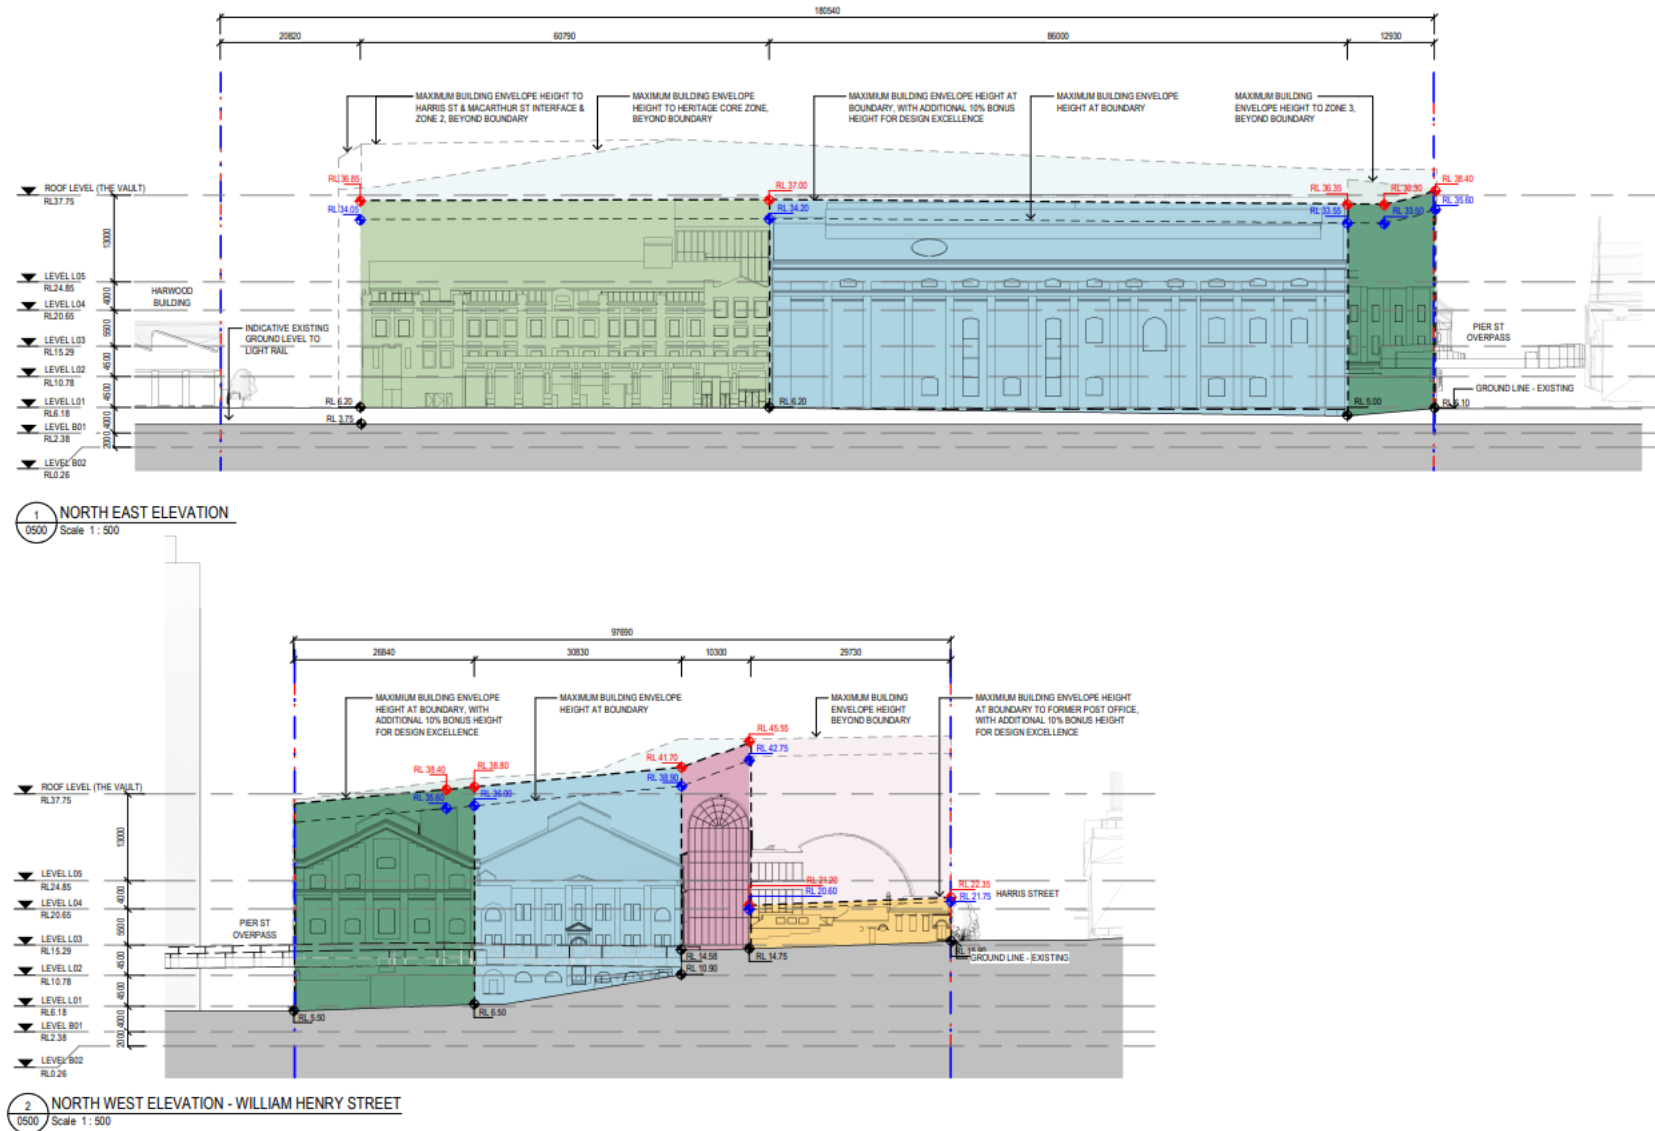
Ultimo Powerhouse- Building Envelope NE & NW Elevation (Source: John Wardle Architects, 17 May 2022)
